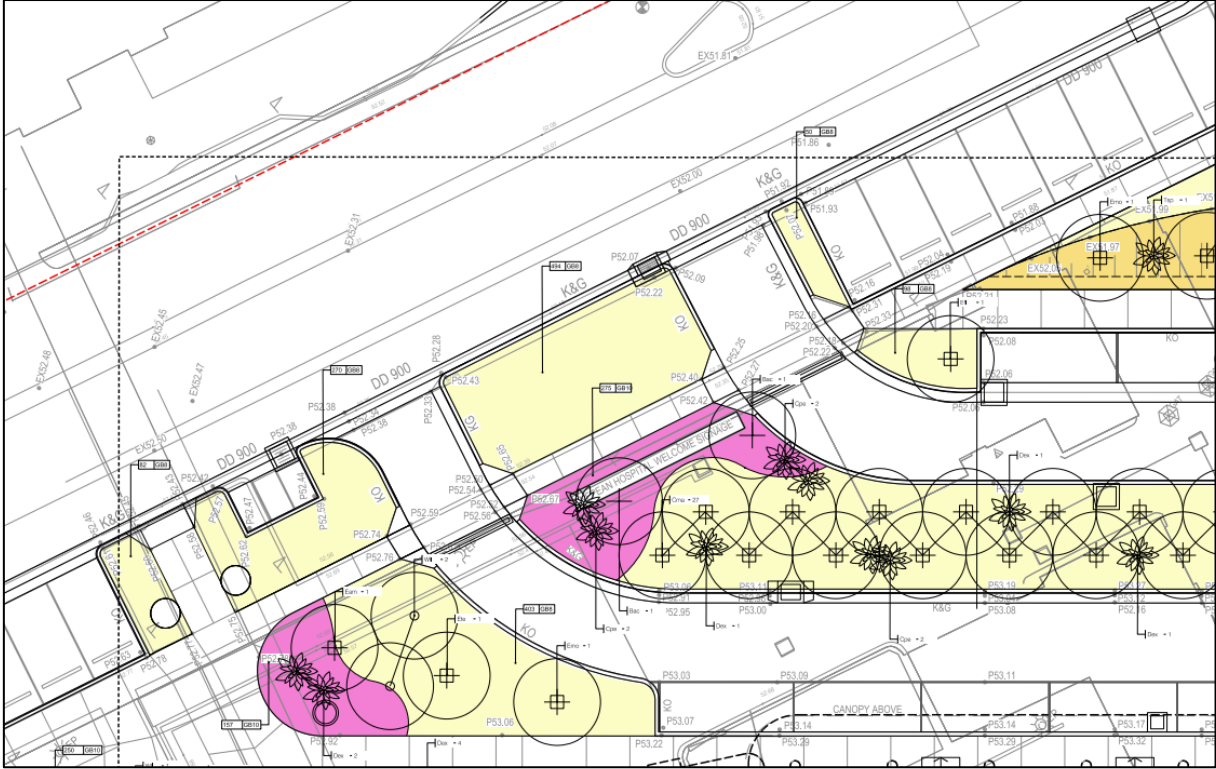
| Extract from the landscape plans showing removal of car parking spaces between the driveways (Source: Tract)
